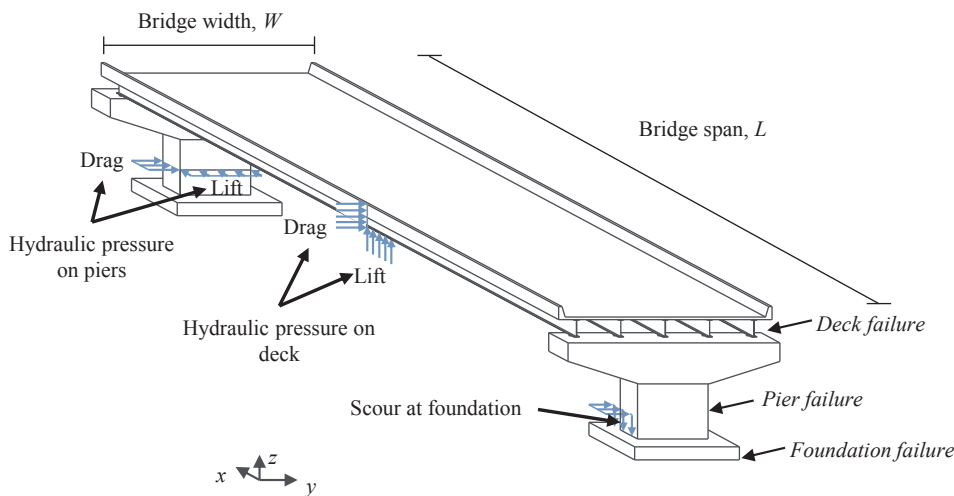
Hydraulic pressures on the bridge deck and pier and scour at the foundation of bridges over water may cause deck failure, pier failure, and/or foundation failure rendering the bridge impassable.
